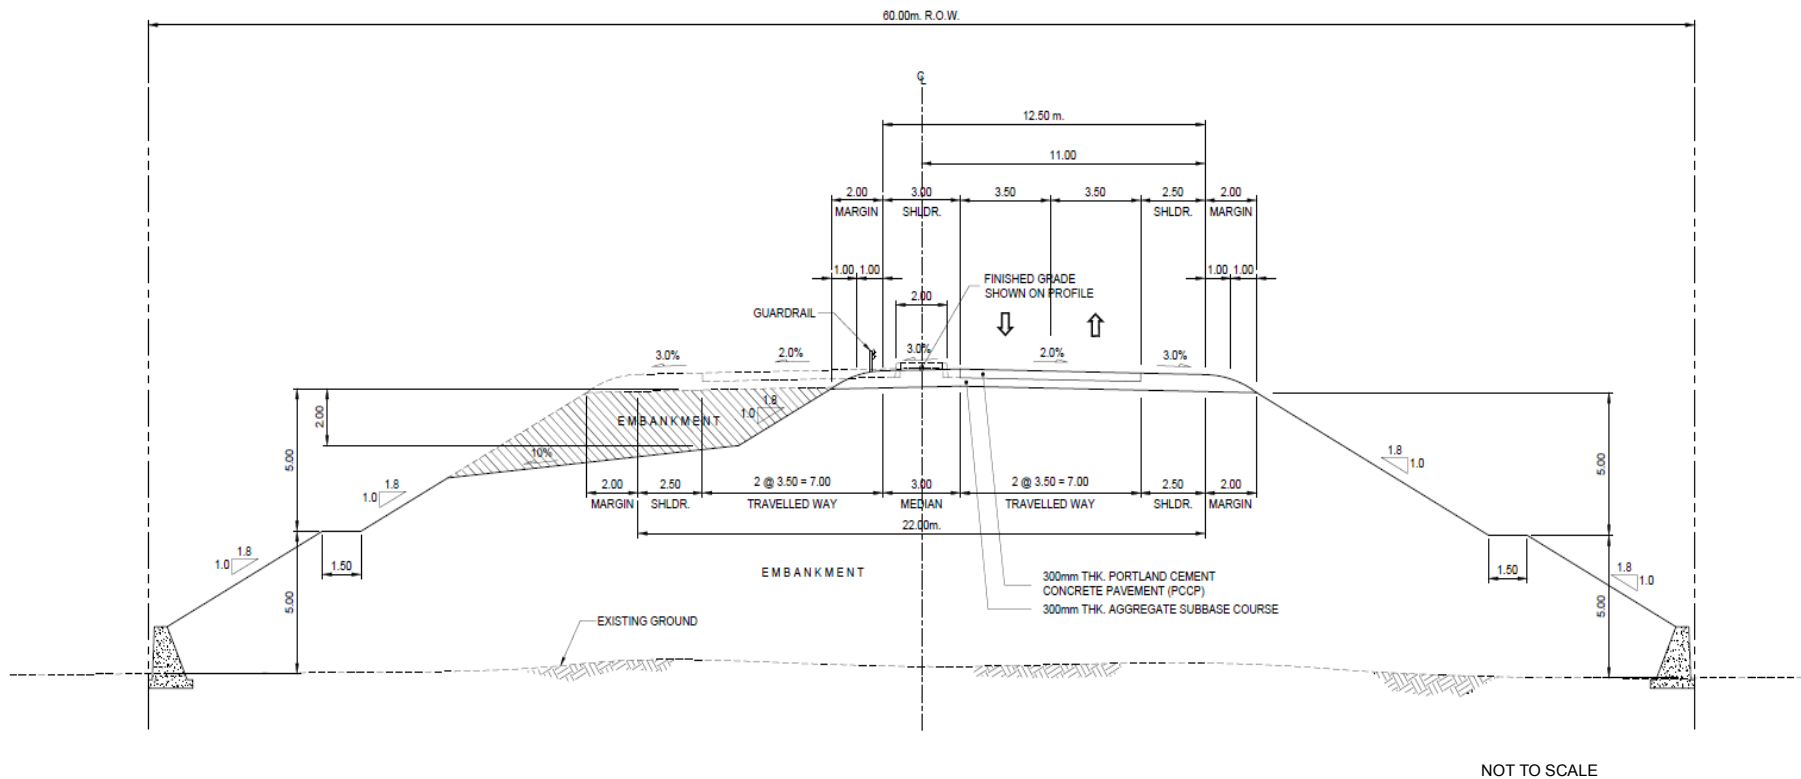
Typical Roadway Cross Section (Embankment)
